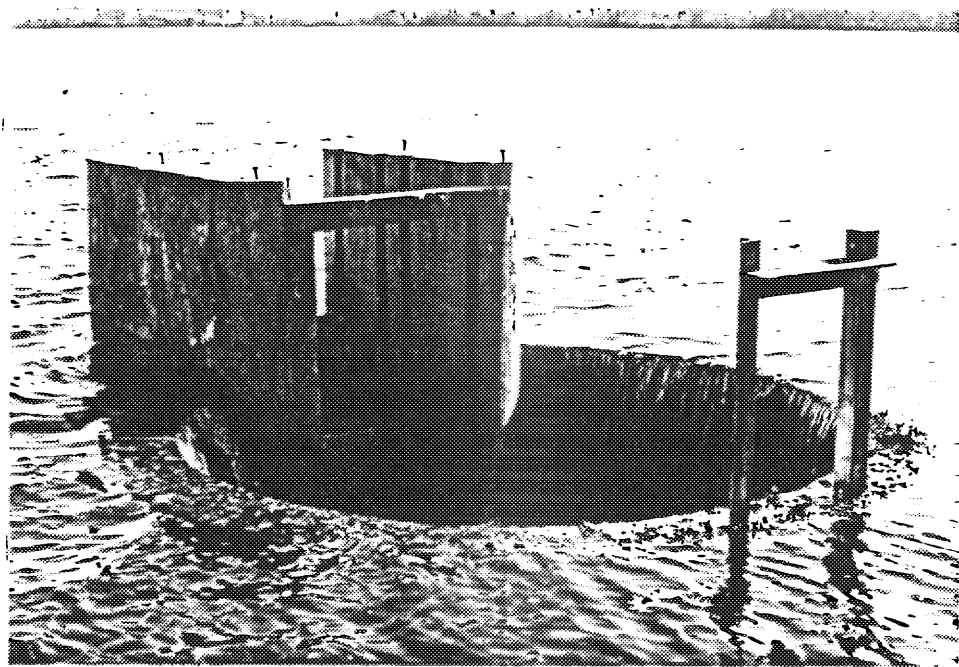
OVERFLOW DROP INLET SPILLWAY (STRUCTURE ALSO CONTAINS STOPLOG CONTROLLED OUTLET WORKS).
